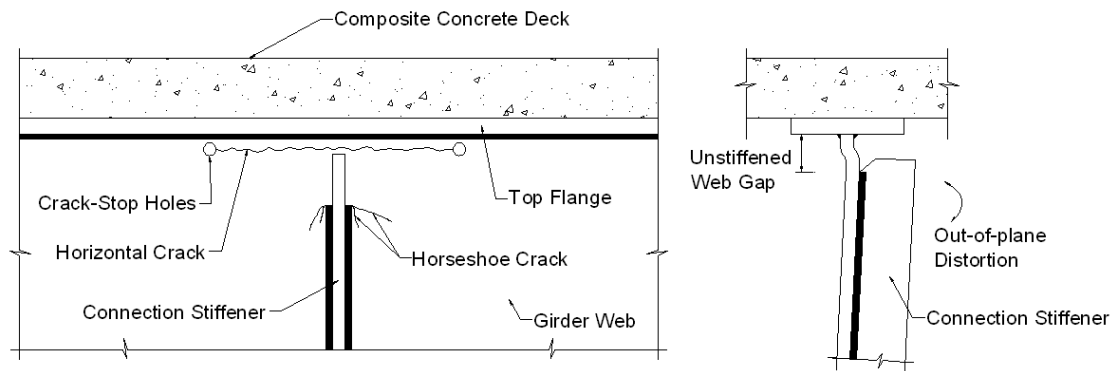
Fatigue crack with drilled crack stop holes in steel bridge girder
